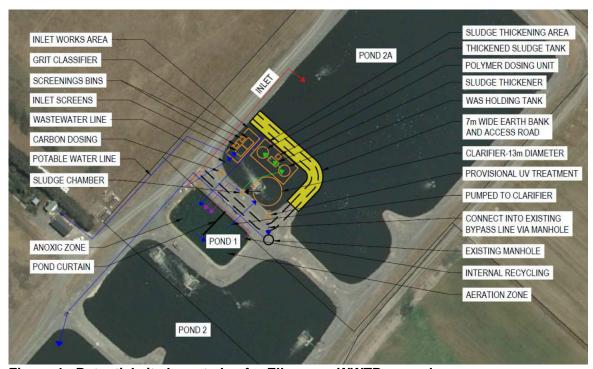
Potential site layout plan for Ellesmere WWTP upgrade
